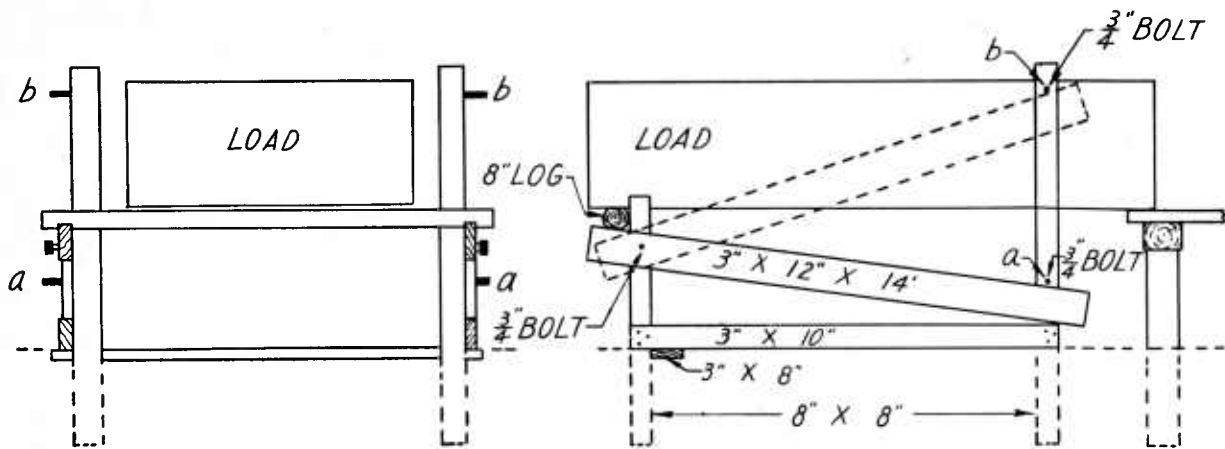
Lever-arm support for load. Left, front view; right, side view. Bolt *a*, when removed, causes plank to pivot upward to bolt *b*, thus lowering opposite end of load. Removal of log brings end of load to truck bunks.
